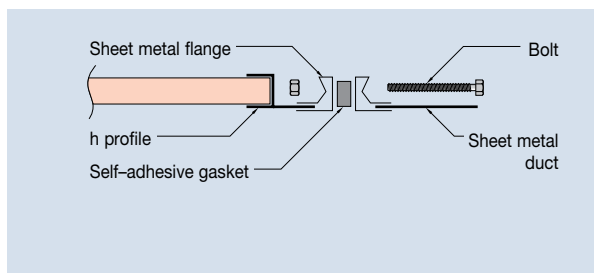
Bolt Coupling Using Aluminium h Profile & Sheet Metal Flange
